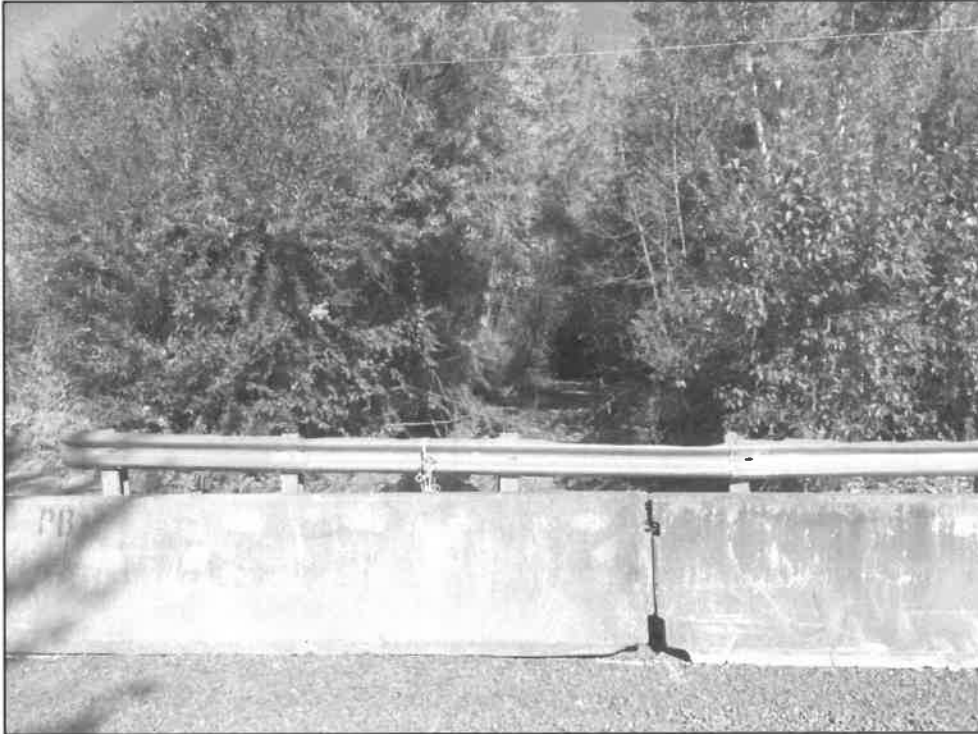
Bar 14 Road Bridge over Naneum Creek.
